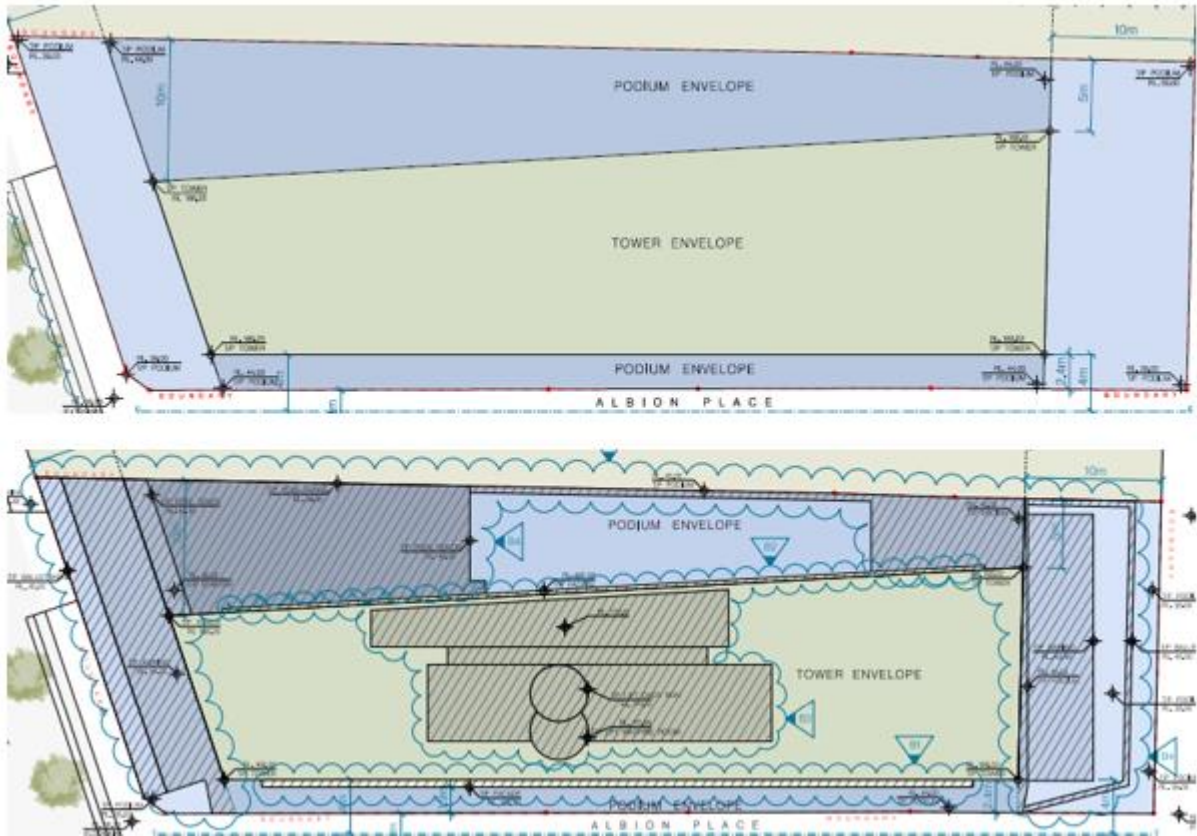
Approved building envelope plan (top) and proposed building envelope plan (bottom), proposed areas of modification identified as hatched
